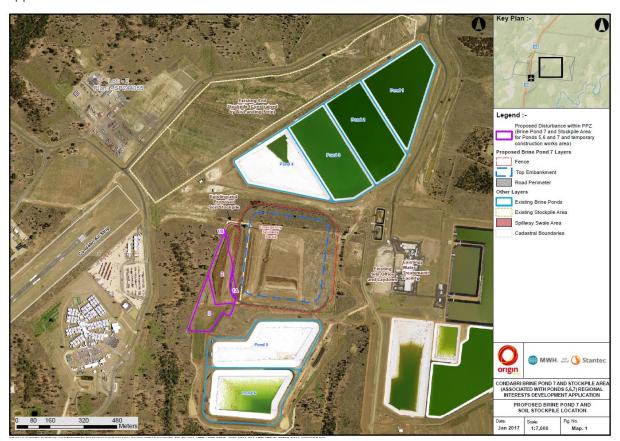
Location plan and overview of proposed Brine Pond 7 and Stockpile Area (associated with Ponds 5, 6 and 7)
